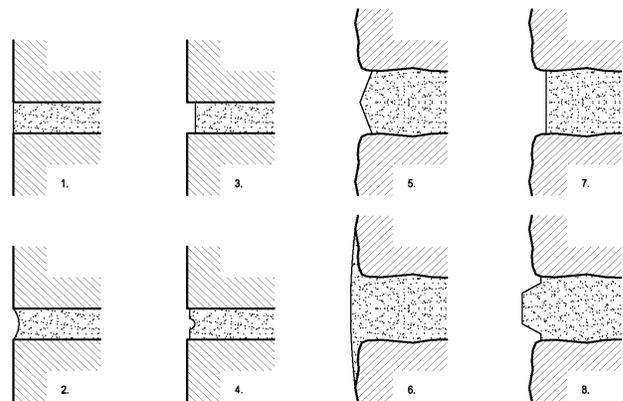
New mortar joint profiles should match the pattern of original pointing. Brick joint profiles shown are 1) flush, 2) concave, 3) slightly recessed – struck flat, and 4) scribed. Stone joint profiles shown are 5) shallow raised ridge, 6) parge pointing (appropriate only where matching existing parge pointing), 7) slightly recessed – struck flat, and 8) raised ribbon.
